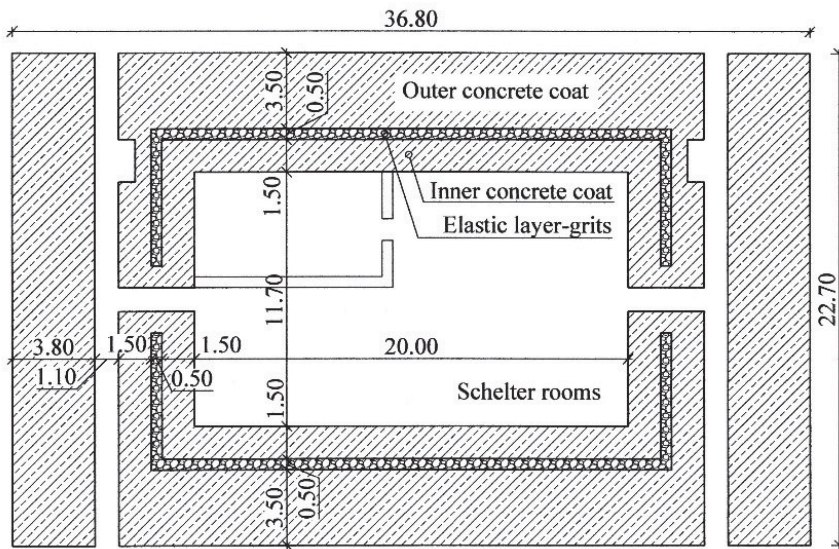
Plan of the Special Communications Bunker with outer concrete coat [4]
